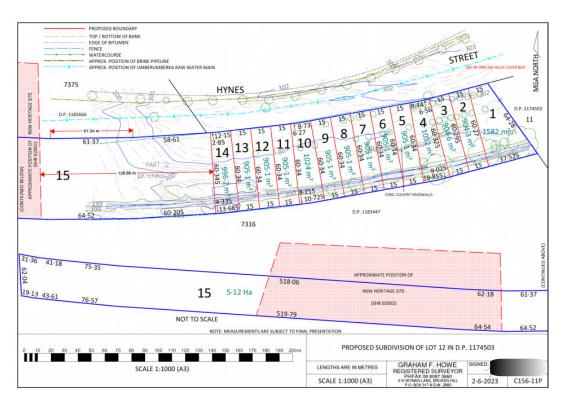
Site survey plan and proposed plan of subdivision¹⁴
